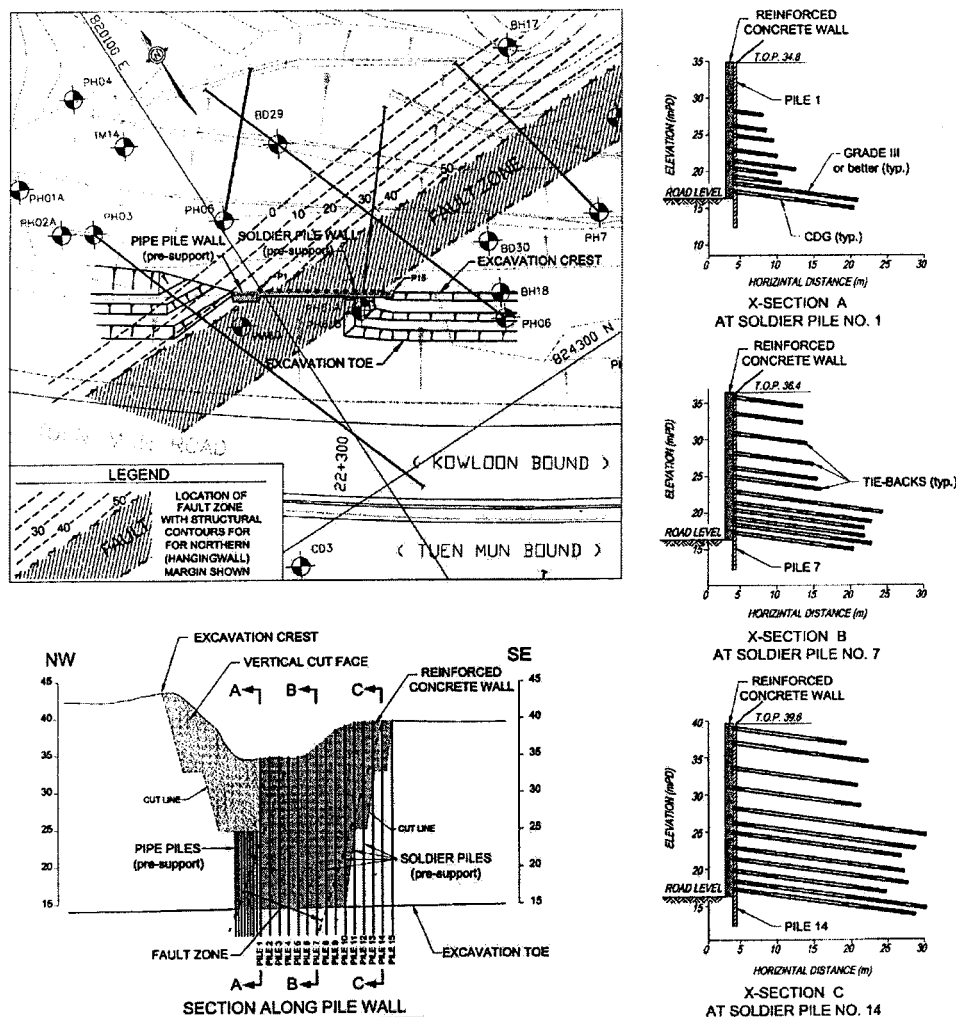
Schematic View of TL/S1 Tied-Back Retaining Wall
